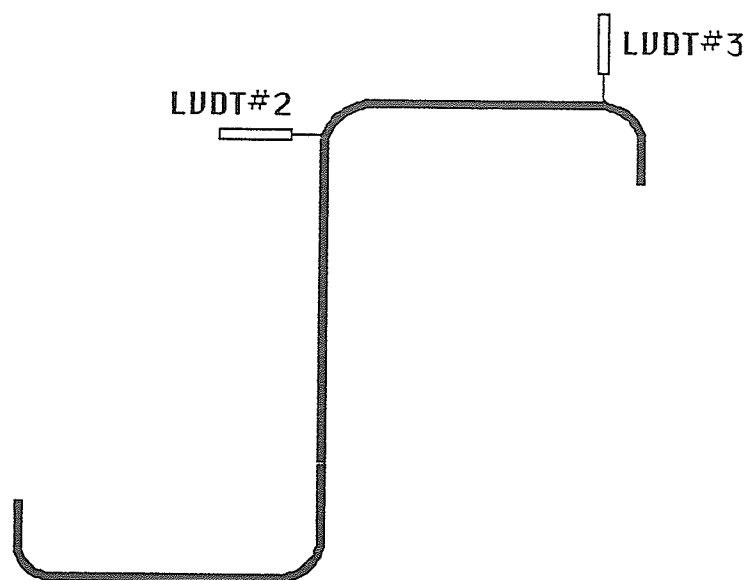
LVDTs Placed on the 24 and 48 inch Column Specimens
